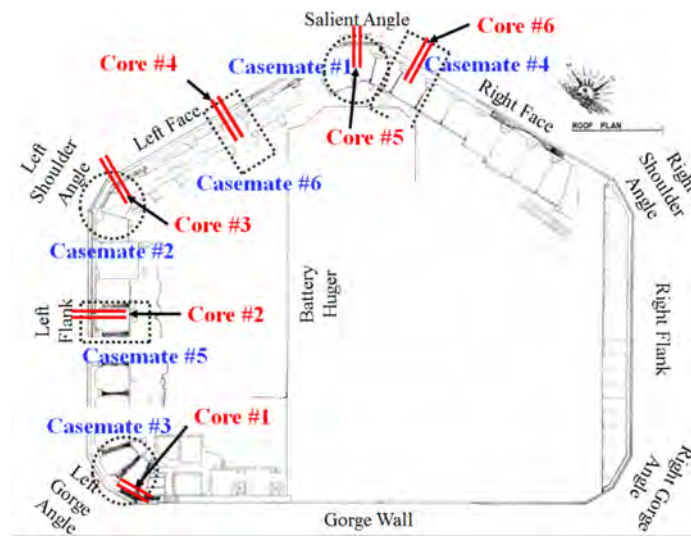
Roof plan marking the six casemates to be modeled and the locations of the core sampling points (plan drawing courtesy of National Park Service).
